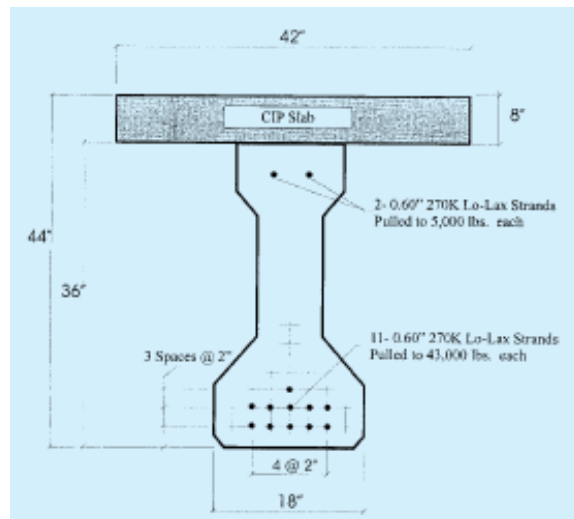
Section Details of Type C Test Girders (M. Shahawy 2001)
